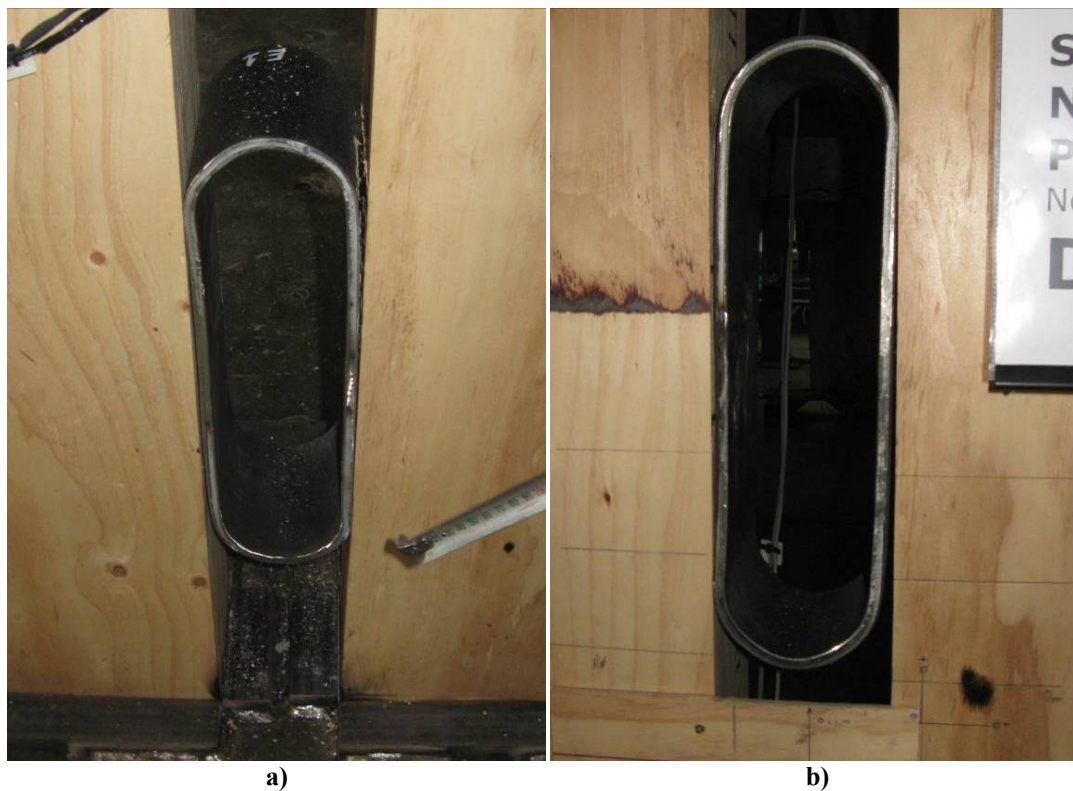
UFP couplers at 2.0% Drift a) E walls, first UFP b) E Wall, second UFP
